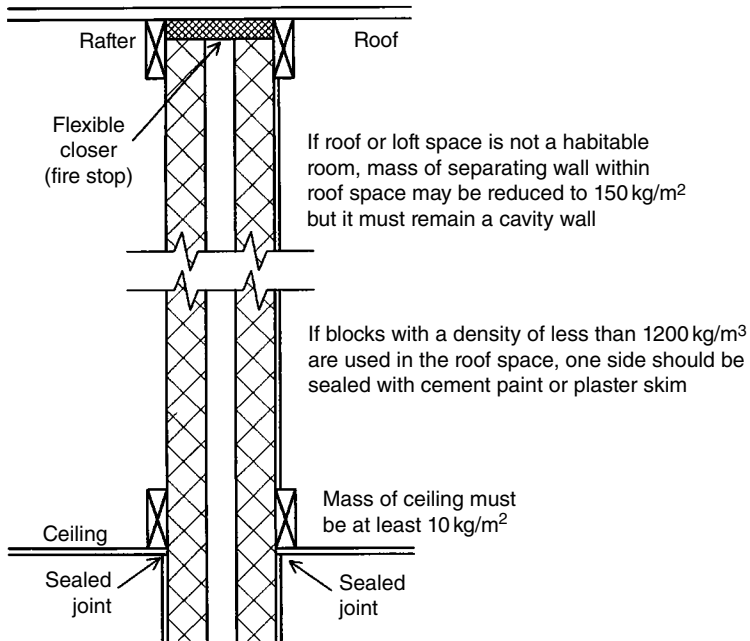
Roof junction using wall Type 2, assuming roof space is not a habitable room.
